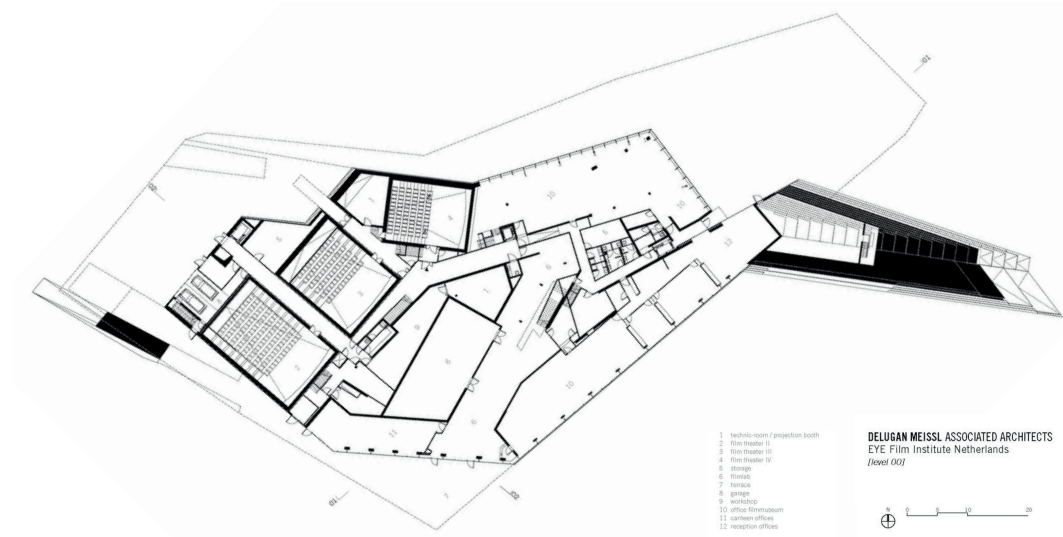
Example of planning document on subarea-level: Architectural drawing EYE film institute (Delugan Meissl Associated Architects, 2009)
